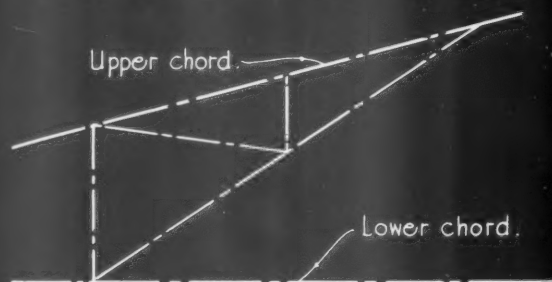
TYPICAL SECONDARY MEMBERS FOR WELDED CONSTRUCTION.
